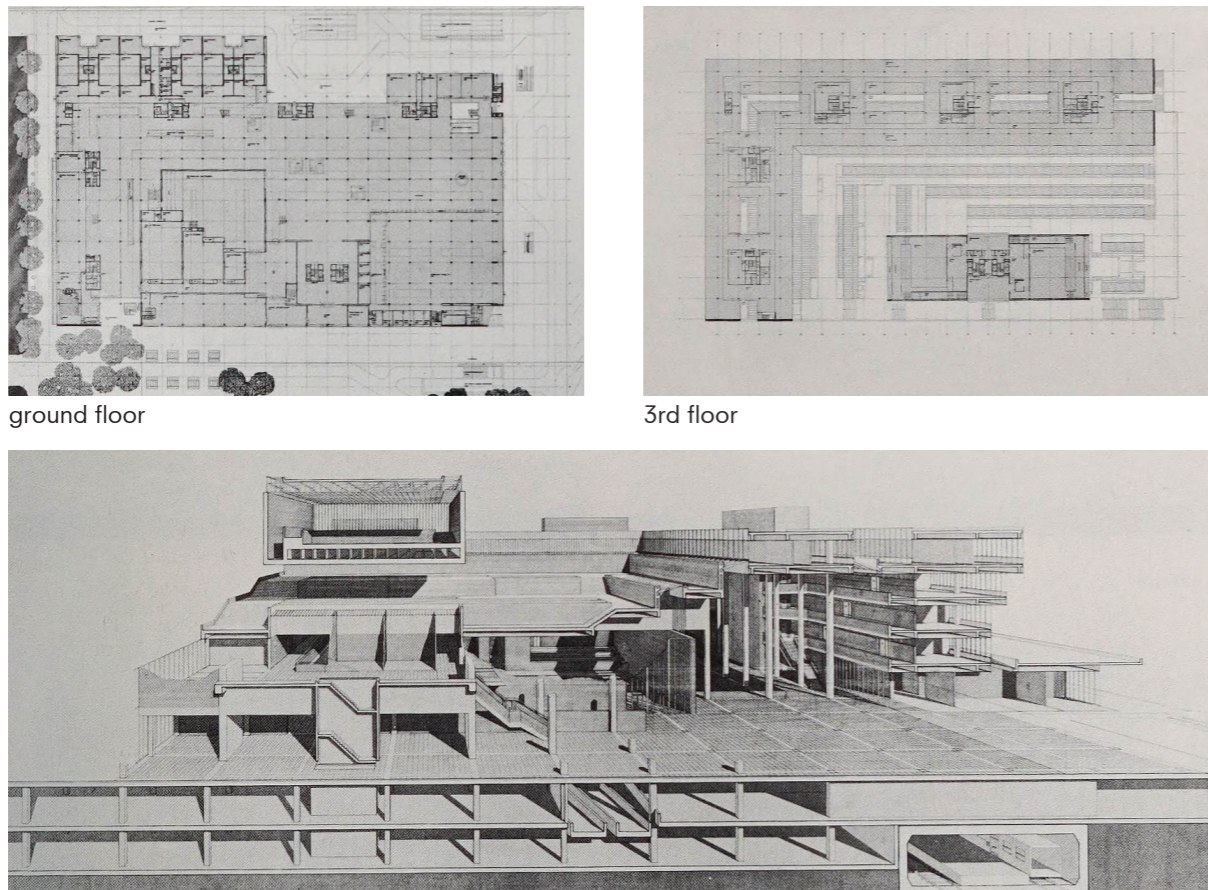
| W. Holzbauer; Two plans and a 3d section from his winning 1968 design (Source: Holzbauer, 1985)
